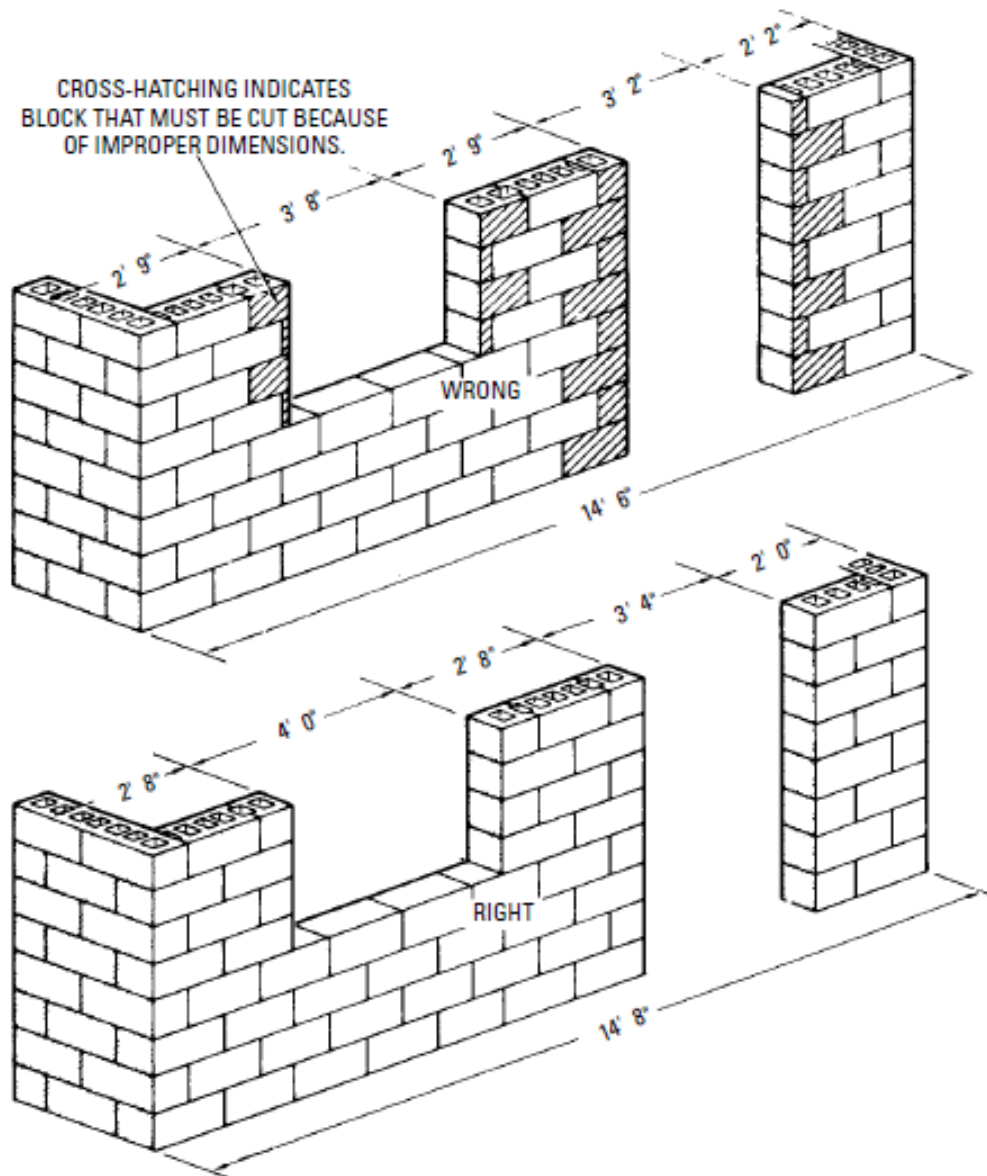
The right and wrong way to plan door and window openings in block walls. (Courtesy Portland Cement Association)
